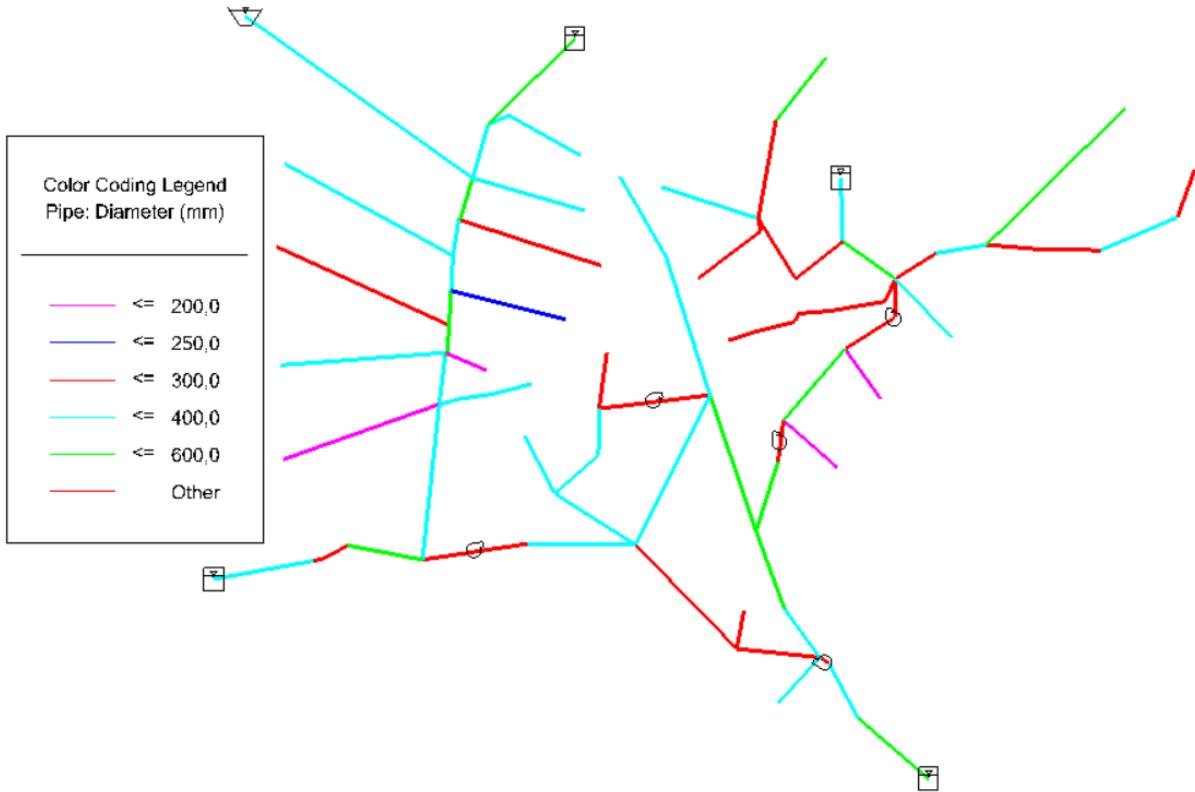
Piping System Renovation Plan for the City of Bukavu
